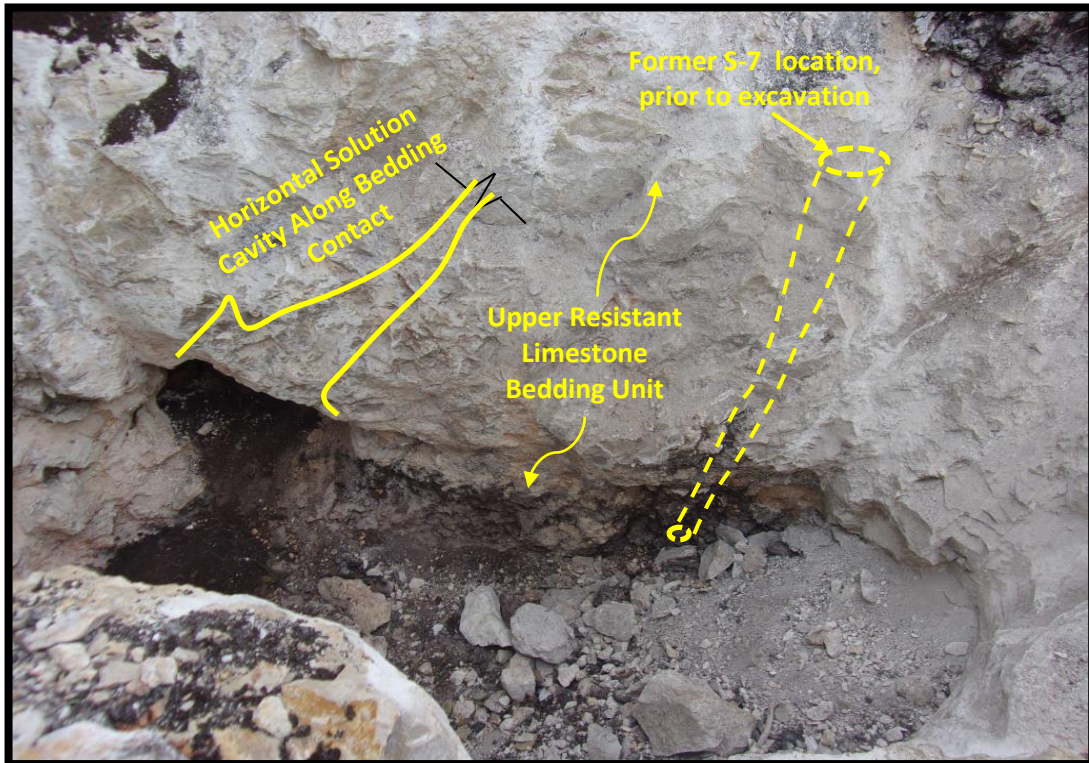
Overview of Feature S-8 opening at base of the bedding contact. Floor of the excavation consists of the weathered contact zone with abundant terra rossa clay infilling.
